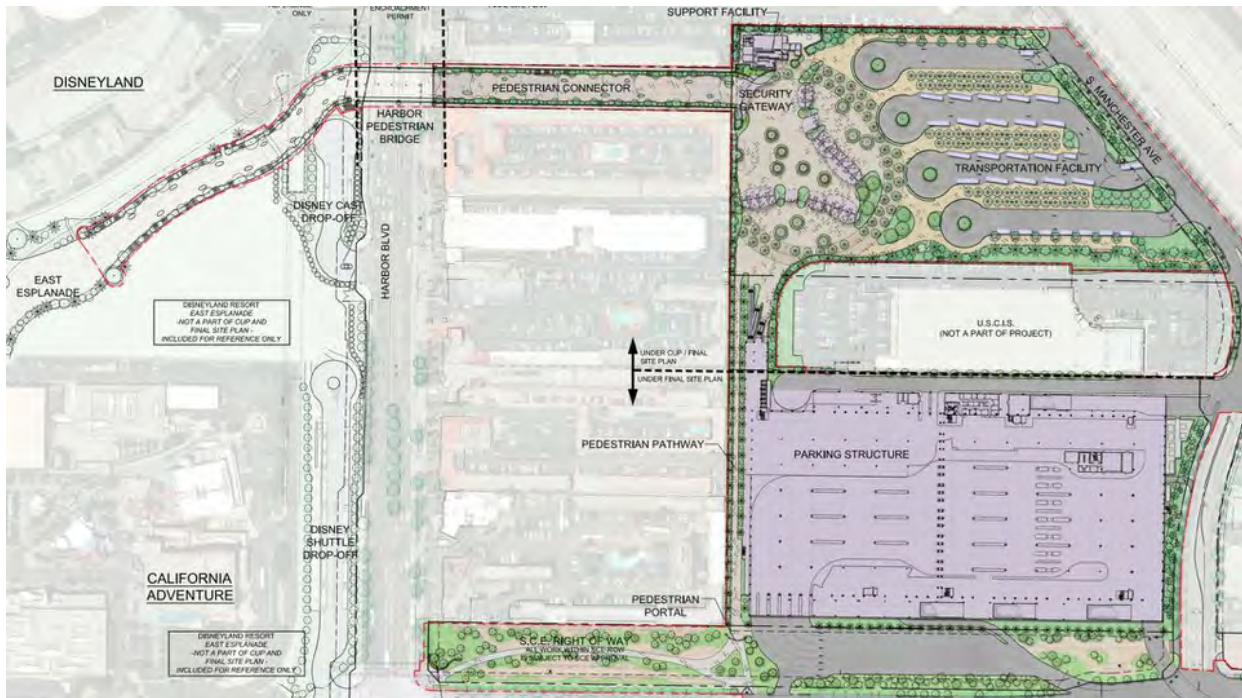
2: The new Disneyland Resort parking structure will be built at the intersection of Disney Way and Clementine Street, with direct access from the northbound 5 Freeway. Guests will access the theme parks via a pedestrian bridge spanning Harbor Boulevard. (Pimentel, 2016)
